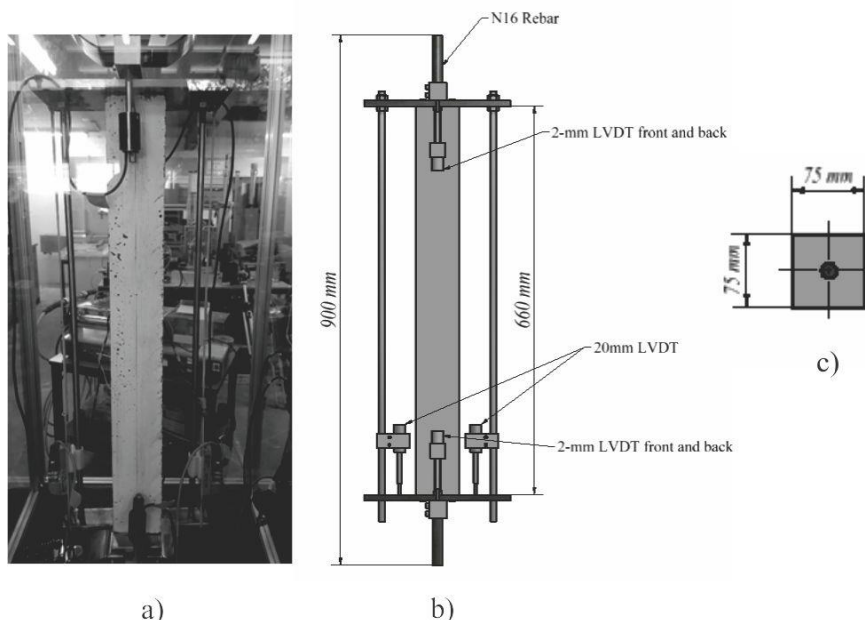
Tension stiffening test set-up; a) Photograph of setup; b) elevation; c) cross-section
